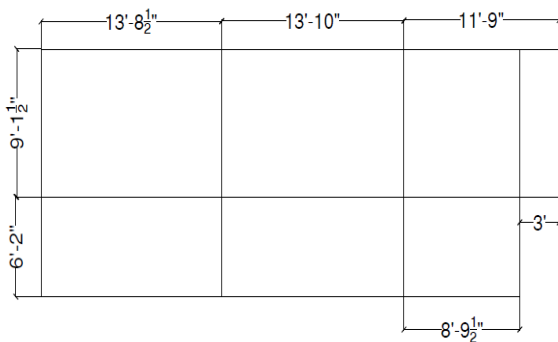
Layout of the site plan used for cost estimation. The elevation was 3.5m
